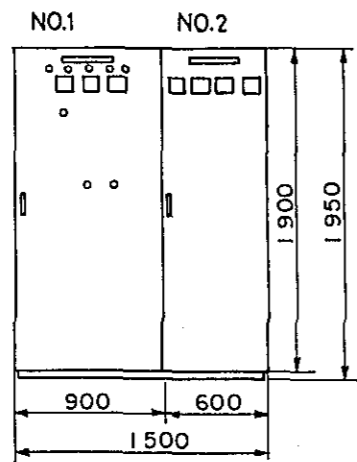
GENERAL VIEW OF NO-BREAK POWER SUPPLY EQUIPMENT
